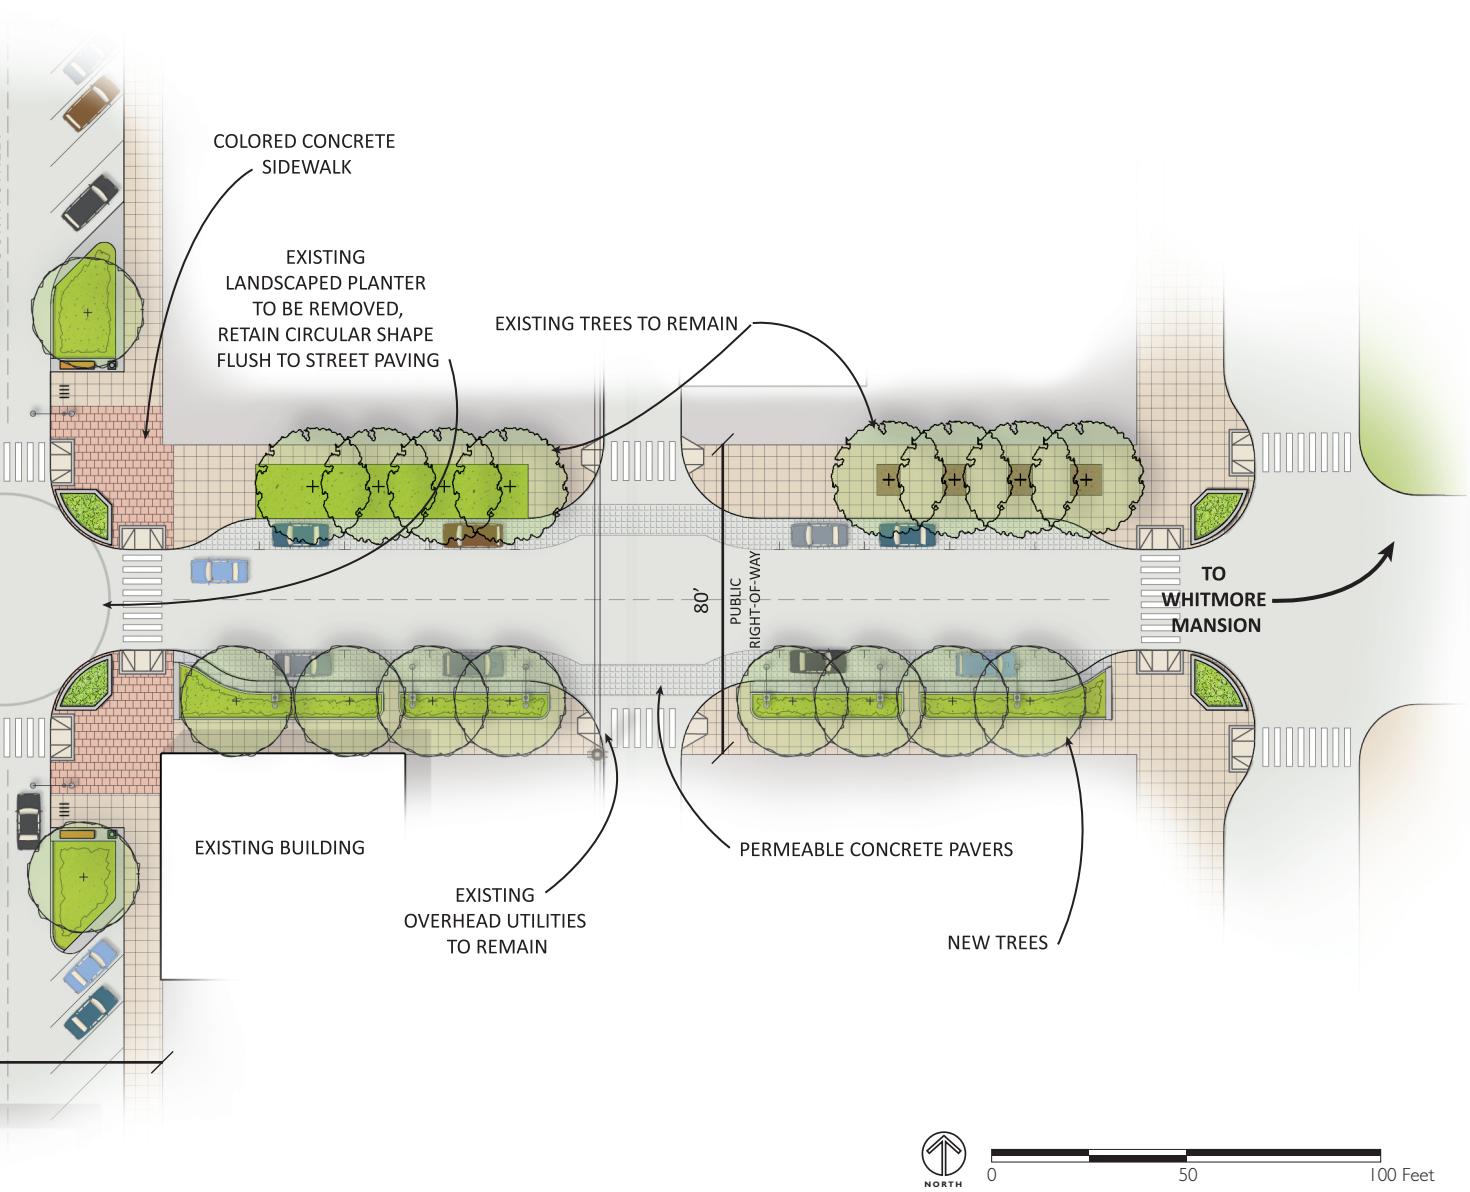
shows a conceptual streetscape plan for North Street, which connects Whitmore Park and the proposed green space at the Whitmore Mansion. The figure illustrates how the North Street Green Connection concept could be implemented in the existing street right-of-way, including a redesign of the Fourth Street/North Street intersection. Some of the existing street trees are proposed to be retained on North Street, however new street trees are also proposed. Bioswales are planted with trees and can also accommodate street lighting. Parallel parking areas are designed with permeable concrete pavers that also assist in stormwater management by allowing runoff to be absorbed back into the ground. All overhead utility wires currently running parallel with North Street are proposed to be removed to improve the aesthetic character of this important Downtown street. It is recommended that overhead utilities located in alleys are preserved since they only cross North Street at alley locations.
